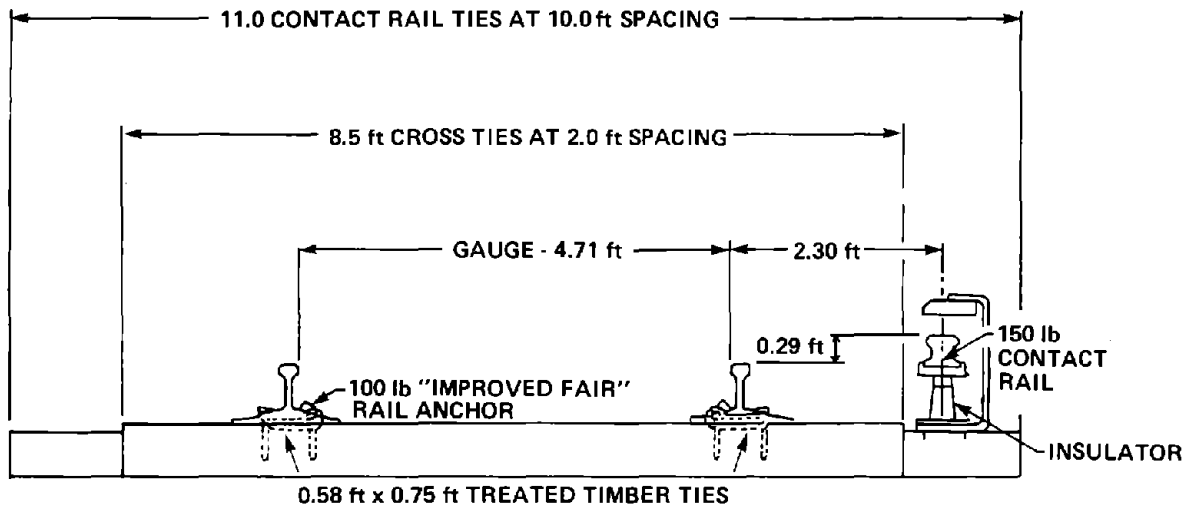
TEST SITE NO. 2 - BOLTED RAIL ON WOODEN TIES.
